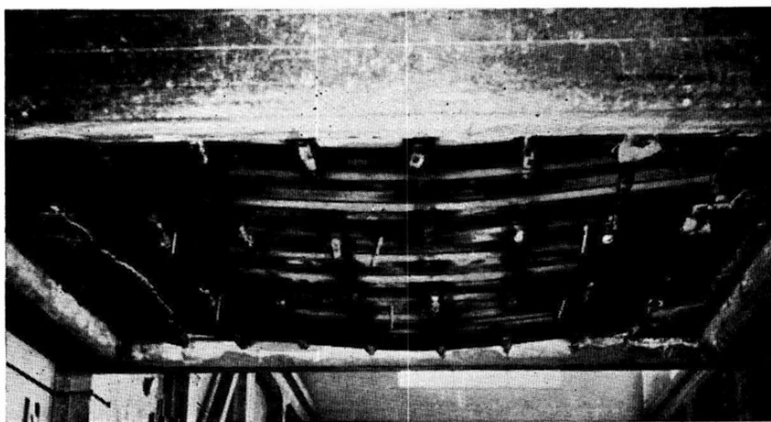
RESULTS OF A FIRE TEST ON SHUTTERING SECTION
